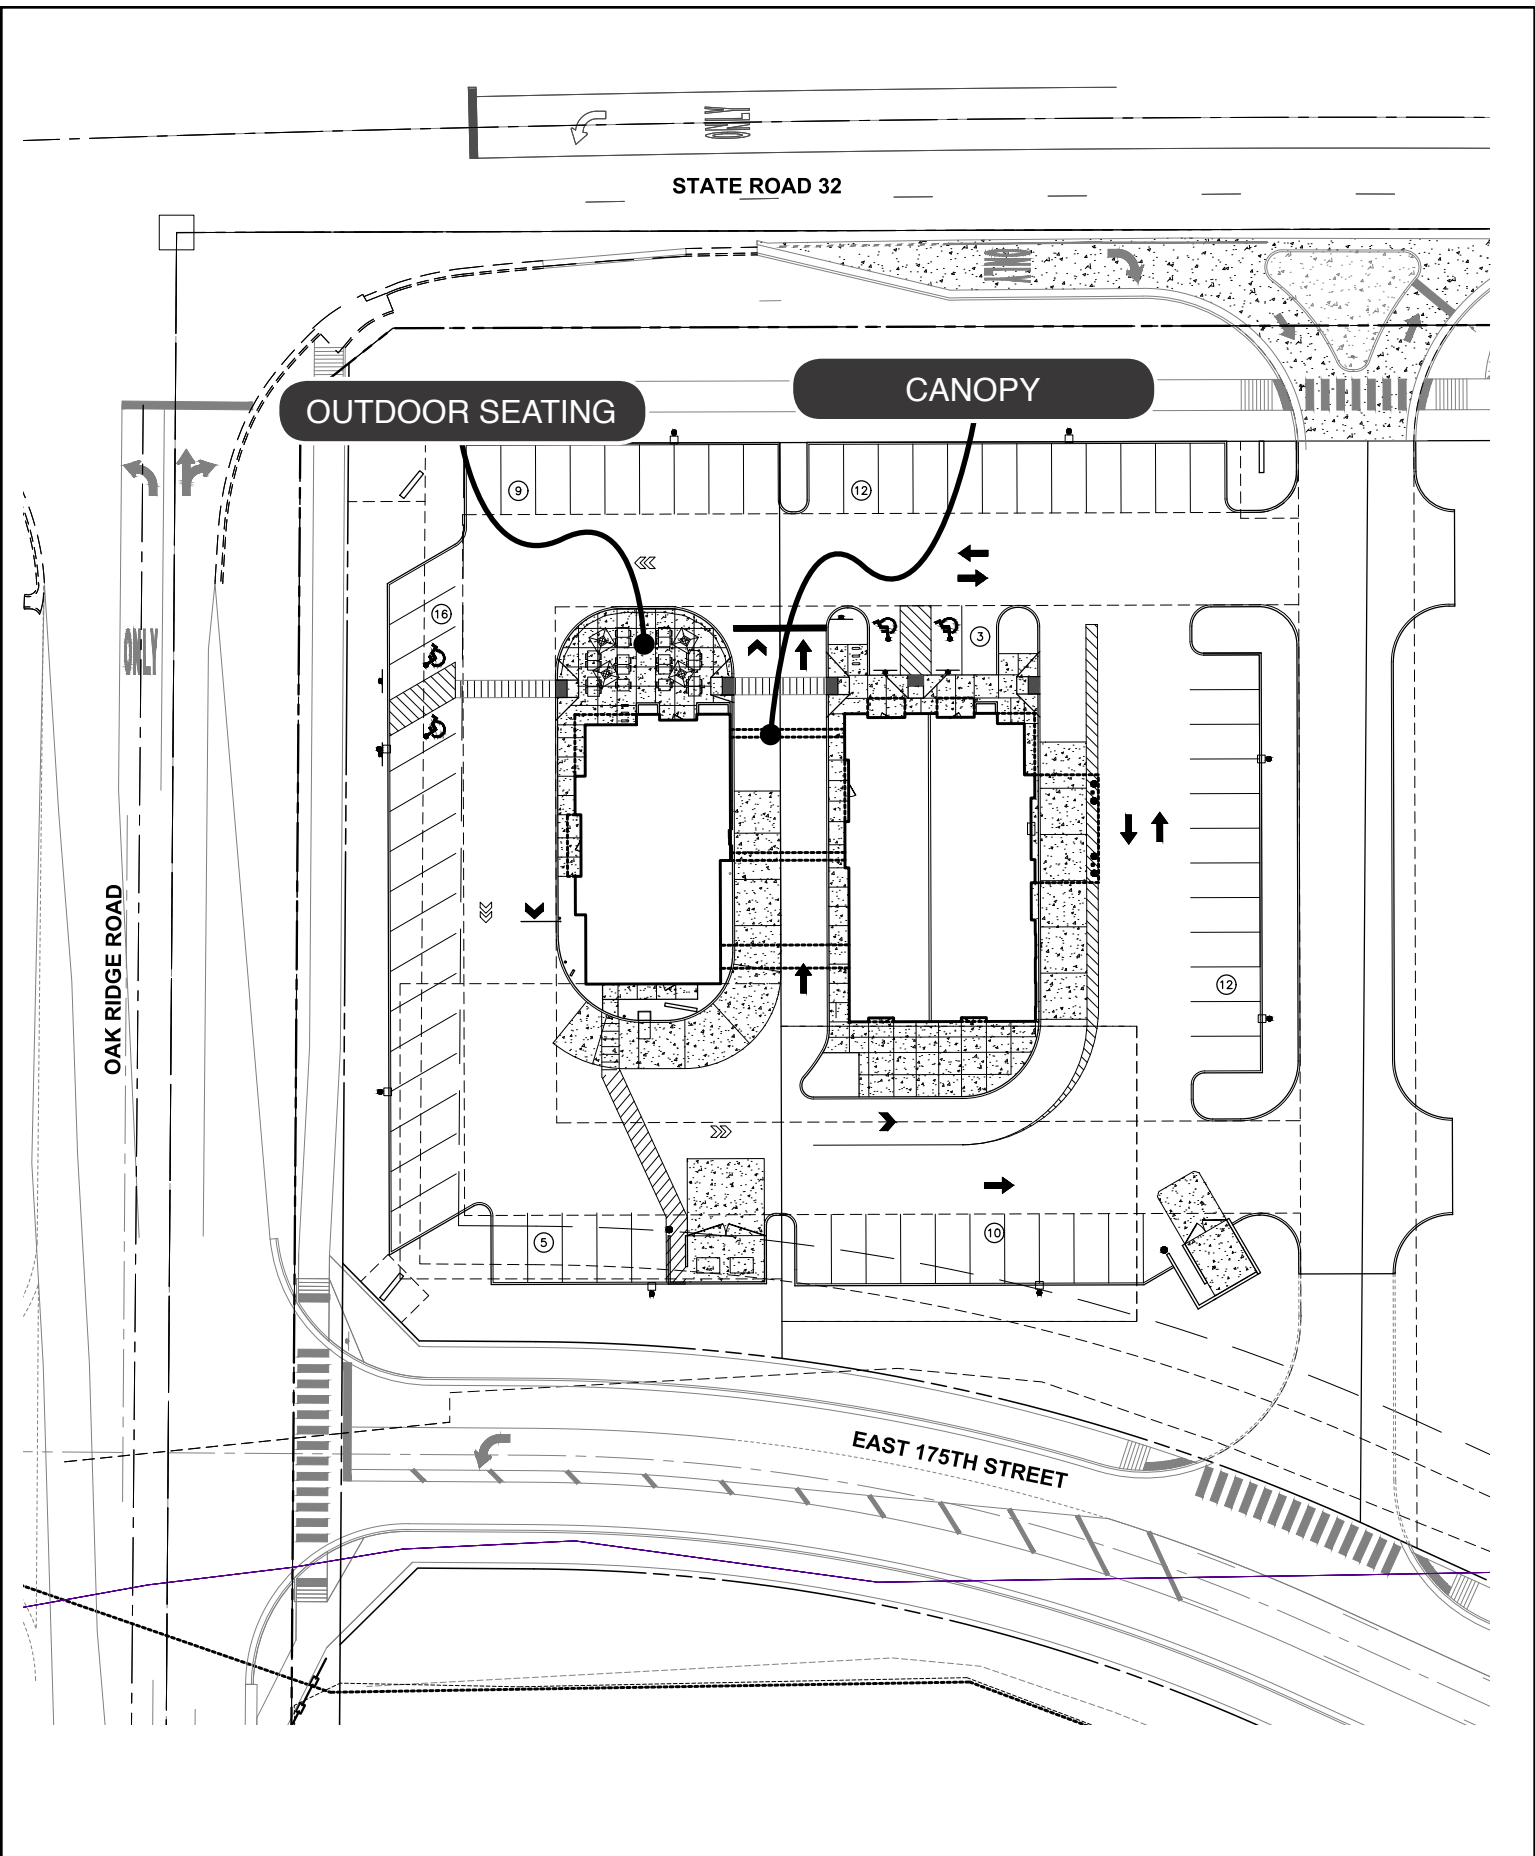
EXHIBIT B: CONCEPT PLAN (LOT 1 + LOT 2)
